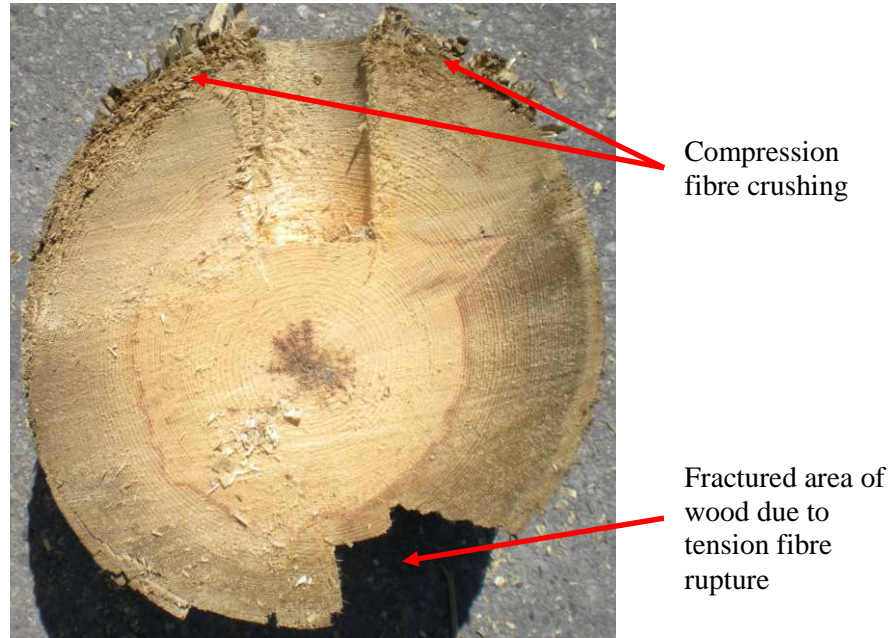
Cross-section of new pole specimen with compression exploratory damage (60-2-3).
